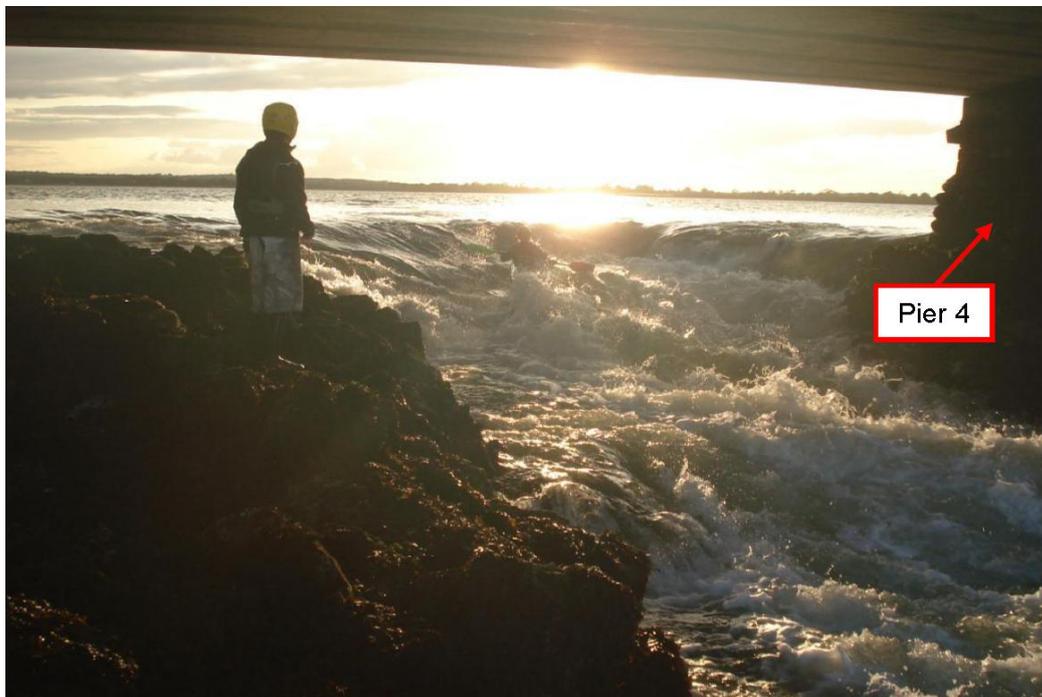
New position of hydraulic jump, between piers 4 and 5
